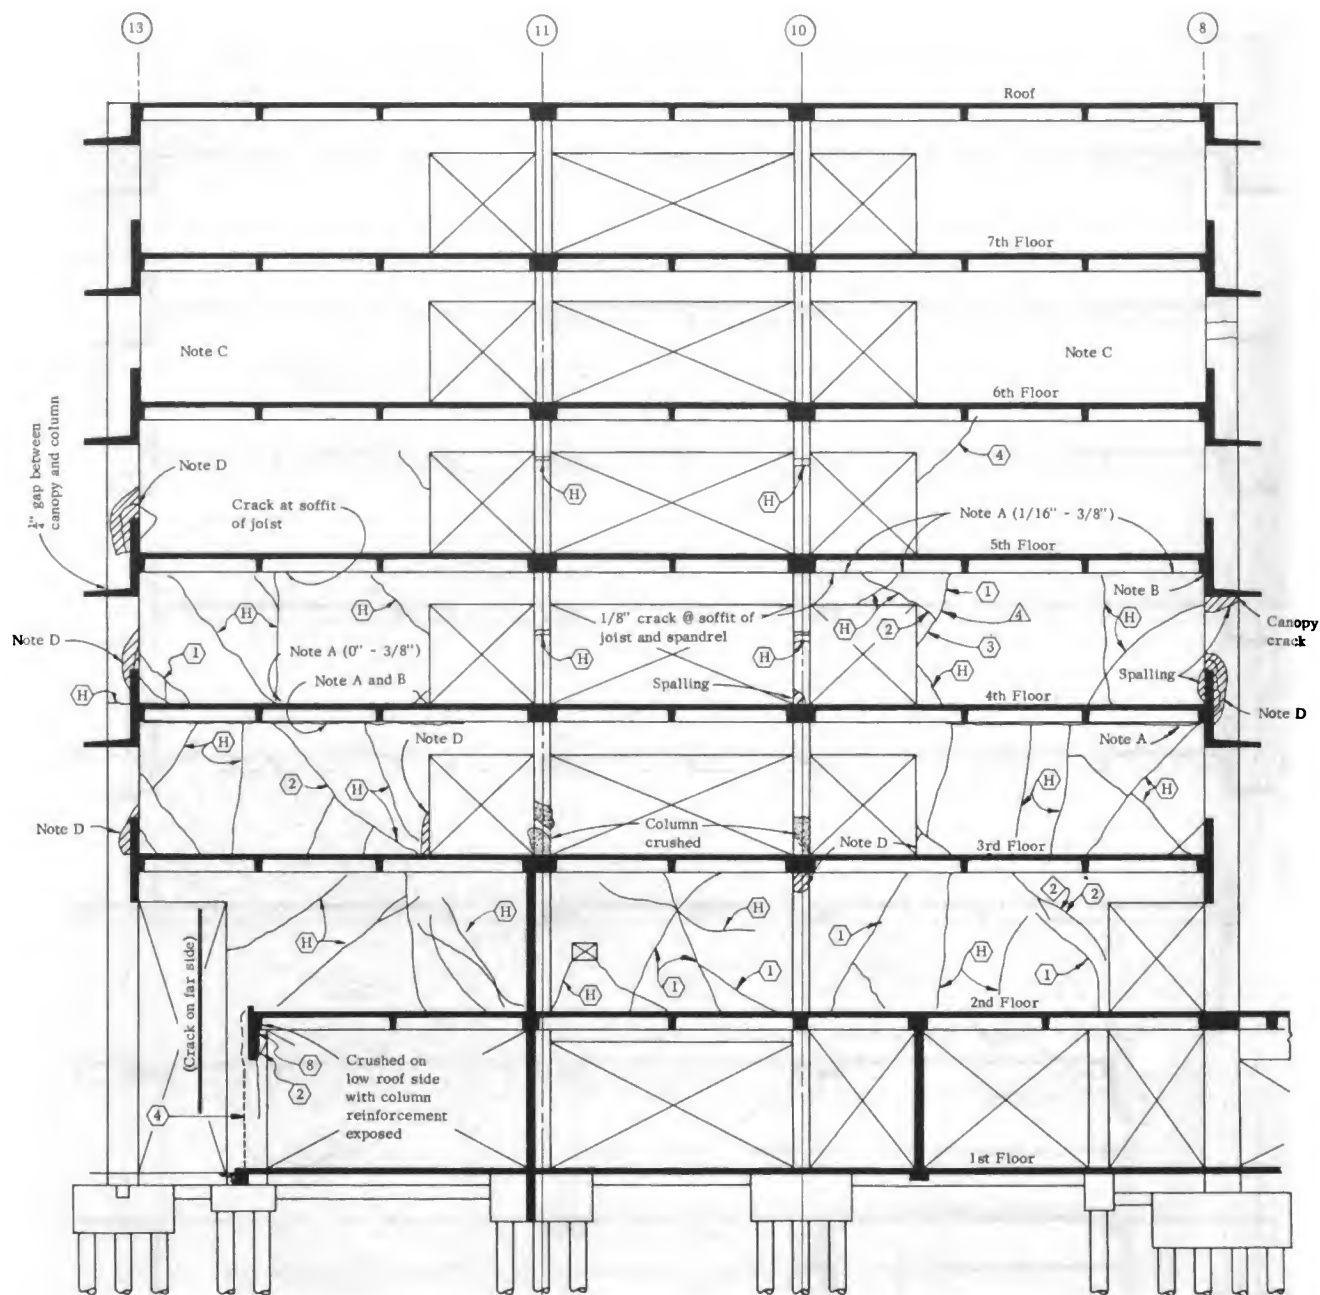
Holy Cross Hospital. Section at grid line N (east wall, 7-story tower).
